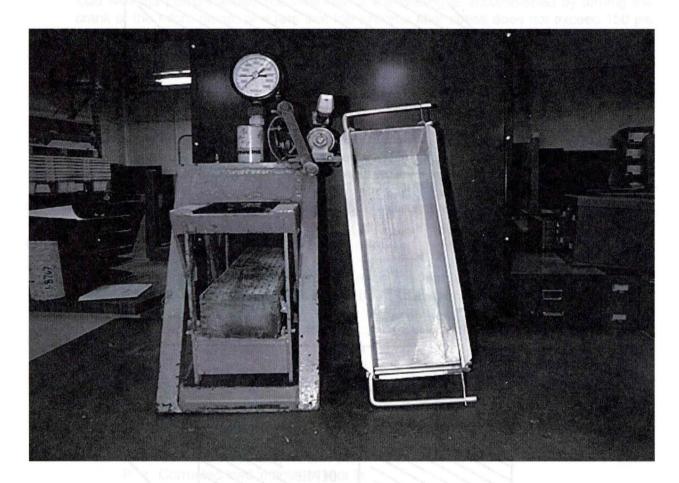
Concrete Specimen in Hydraulic Testing Machine
